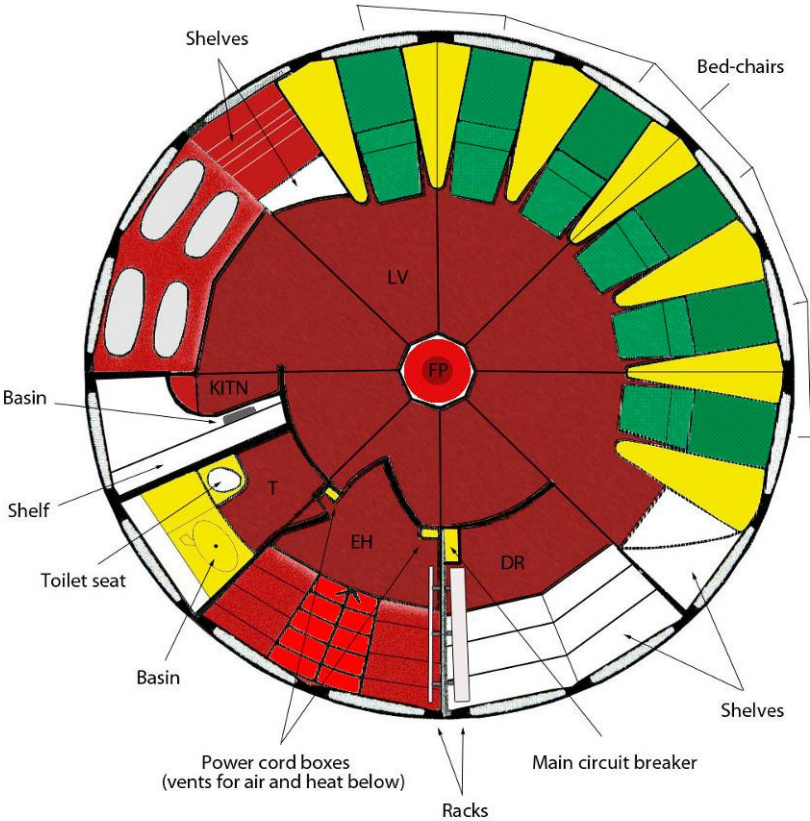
Ground plan of Futuro no. 001. Explanations and colours have been added to fit Futuro no. 001. (Funck 2004)
